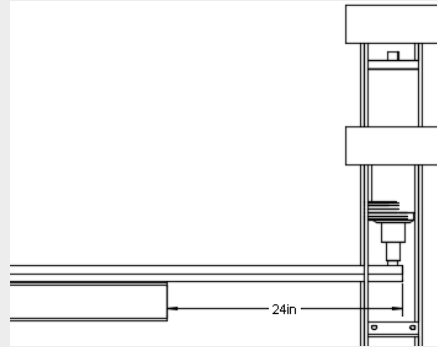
Transverse View VR48 Part, anchor and force block
